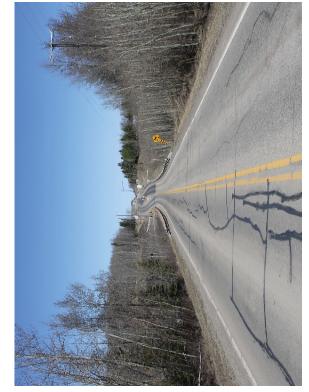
199th Street looking northbound from Woodbend Wynd.
